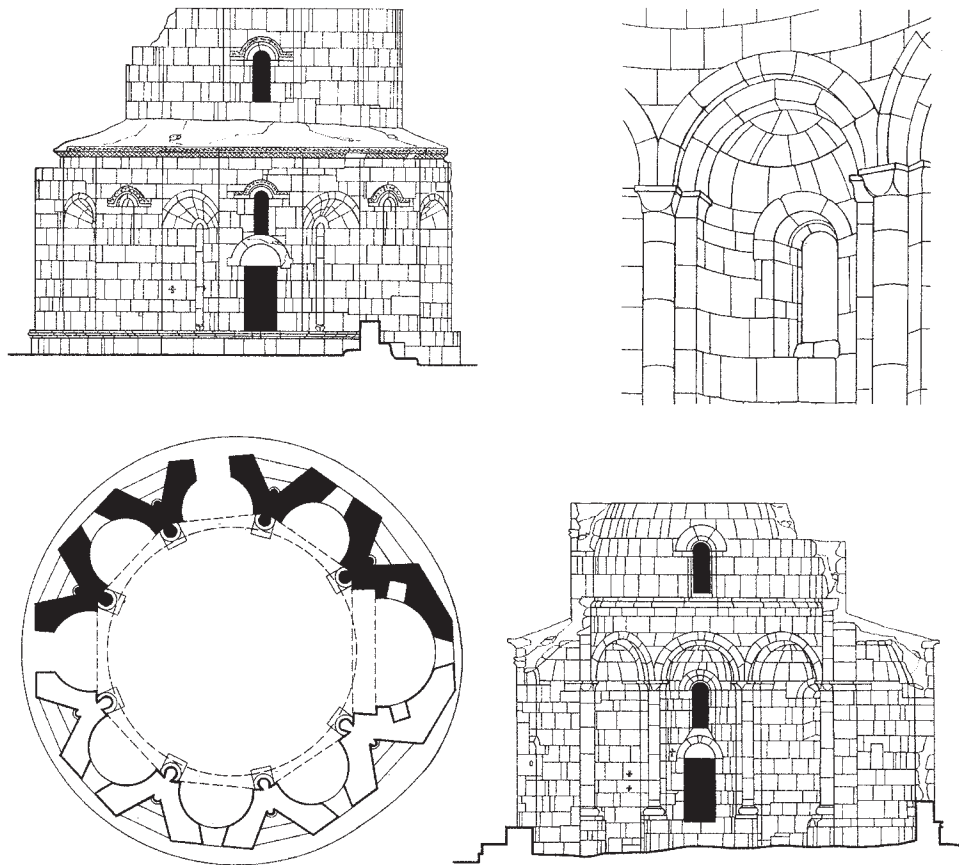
Zoravar Church, 670s, plan, façade, section and drawing of an exedra (Hasratian, 2000)
